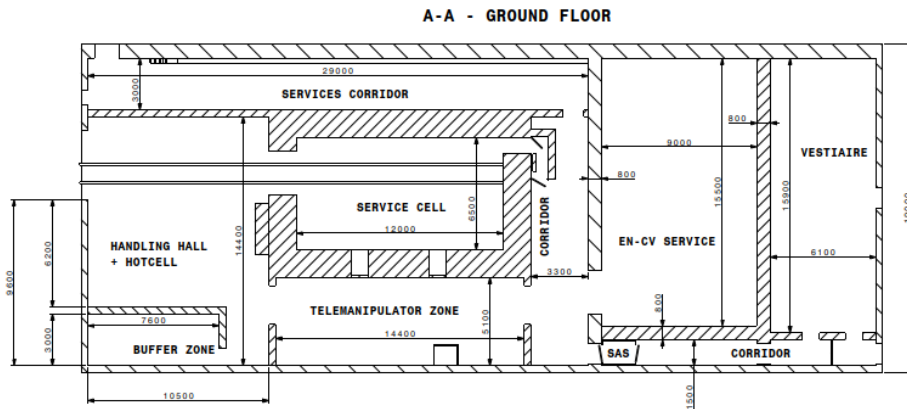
The layout of the service building indicating the various activities (preliminary design)
